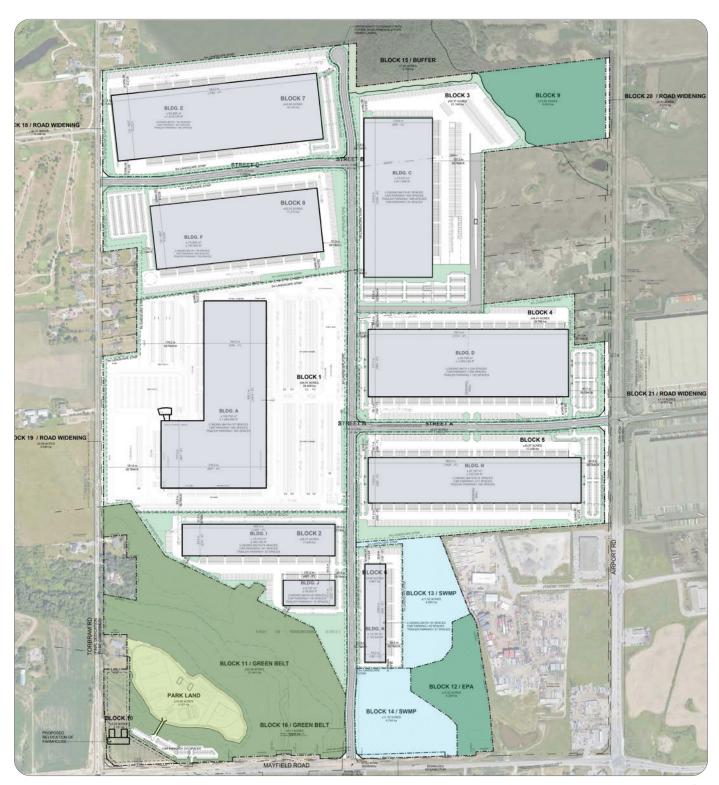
Proposed revised Site Plan prepared by Turner Fleischer Architects Inc.
